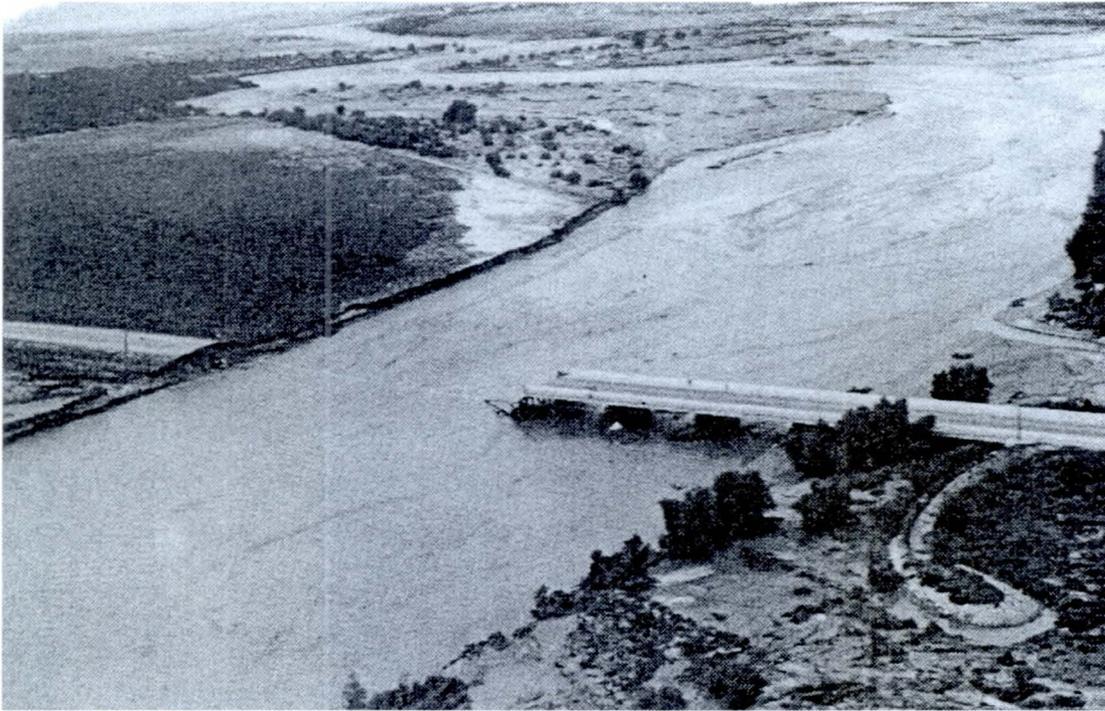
Aerial photograph of the Ina Road Bridge, Santa Cruz River, AZ, looking northwest after the 1983 flood (PCDOT, 1984). The gap in the roadway was due to failure of the west abutment by lateral erosion.
